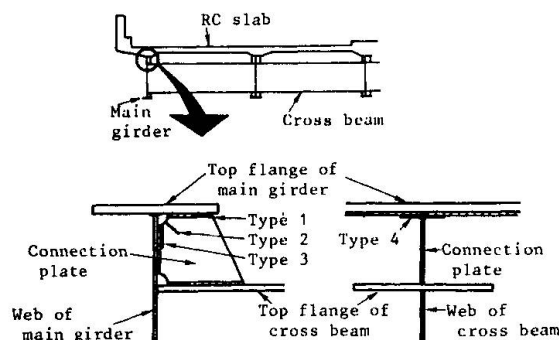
Fatigue cracks at cross-beam connections of plate girder bridge
